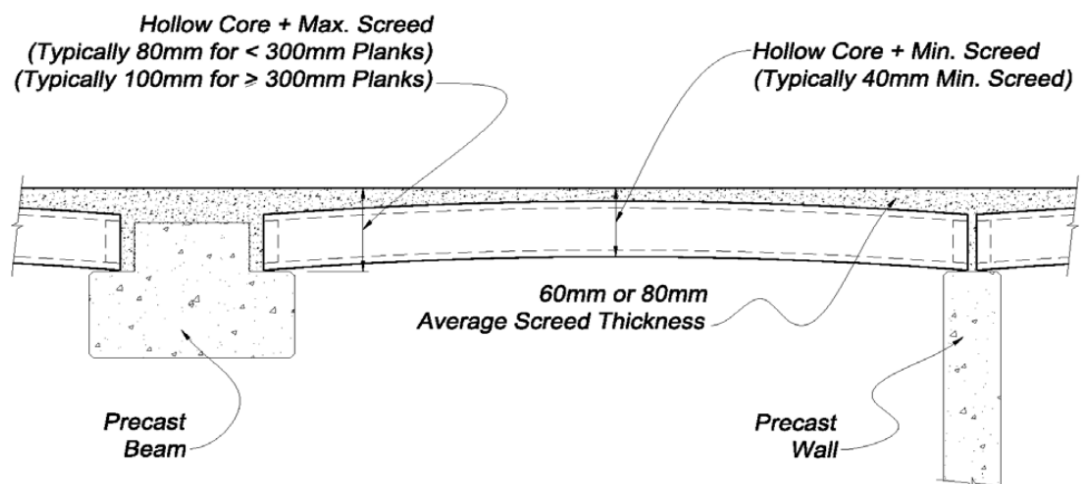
Provision for Camber for Hollow Core Slab and Topping Detailing
